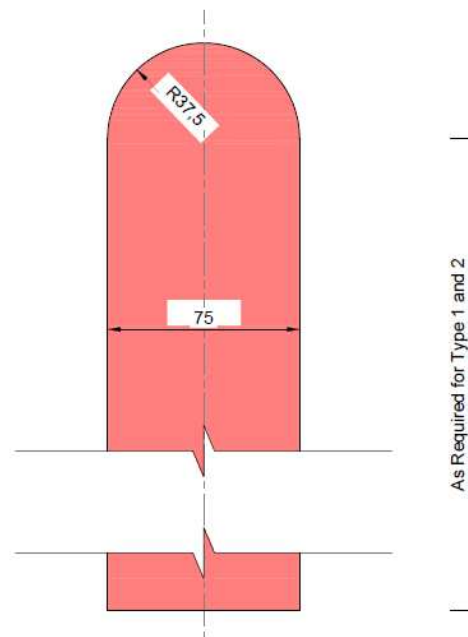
Plan view of model crest pier – dimensions shown in mm
